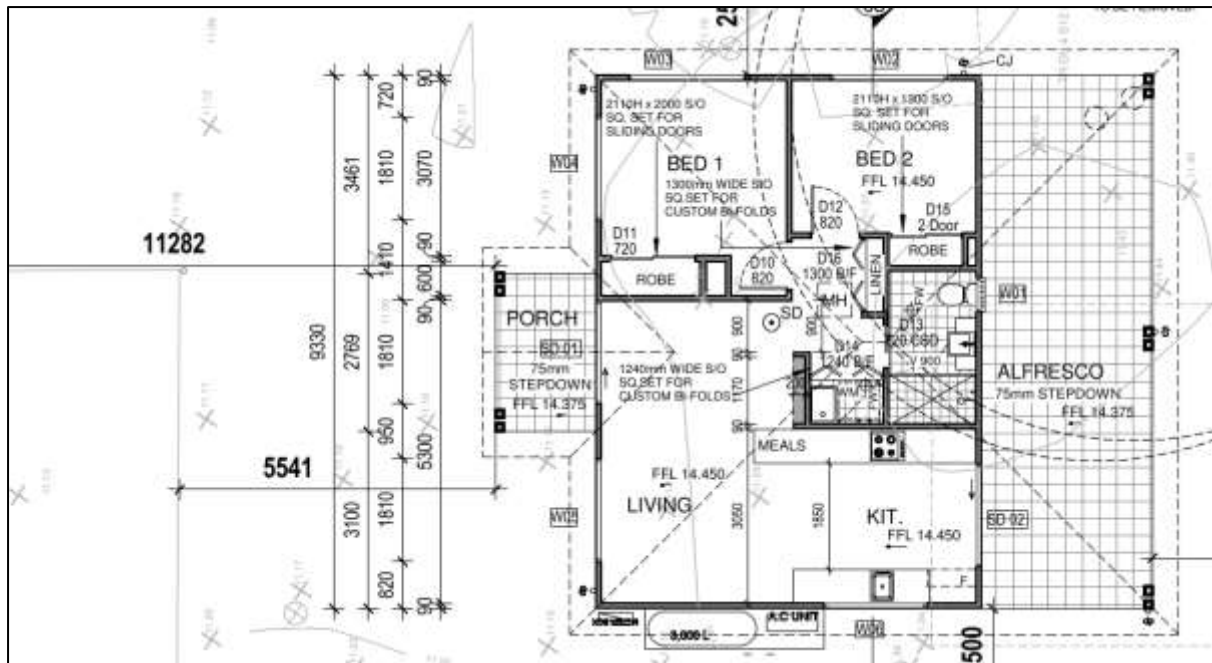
Extract of the initial floor plan submitted showing an alfresco of 28m².
